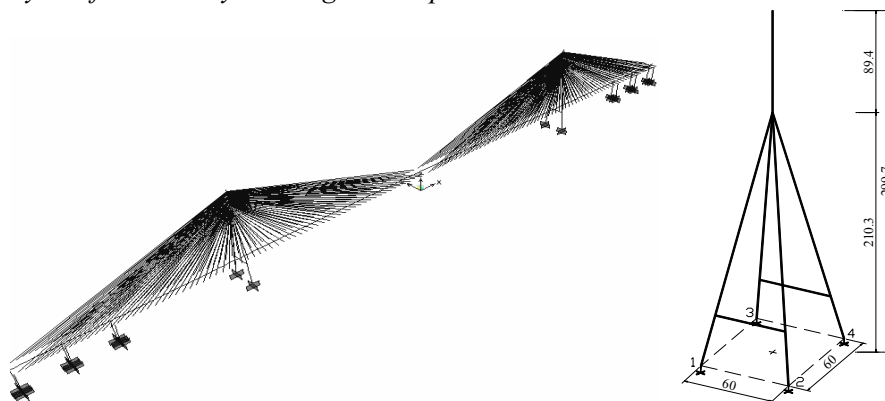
The FE model of cable-stayed bridge Figure 12 Spatial tower (Unit: m)
